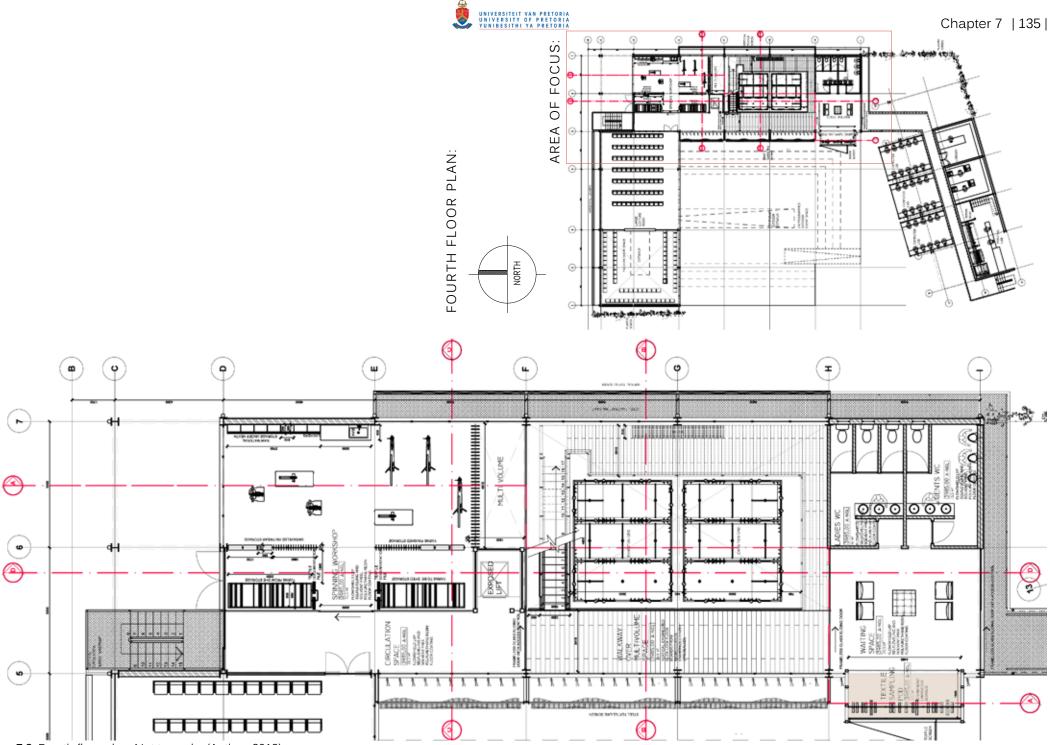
Fourth floor plan. Not to scale. (Author, 2012)
